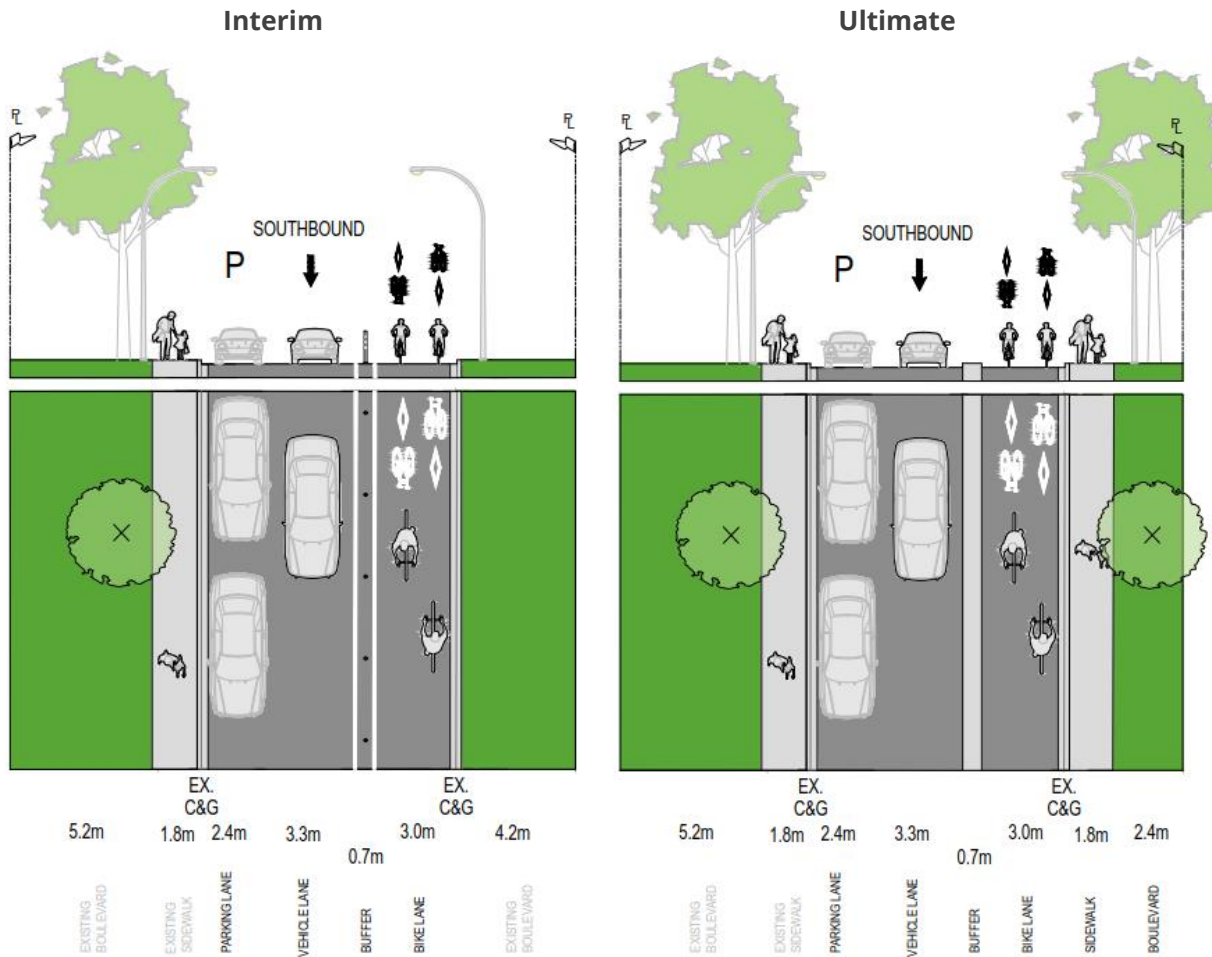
Johnston Road Proposed Illustrative Cross-Sections
